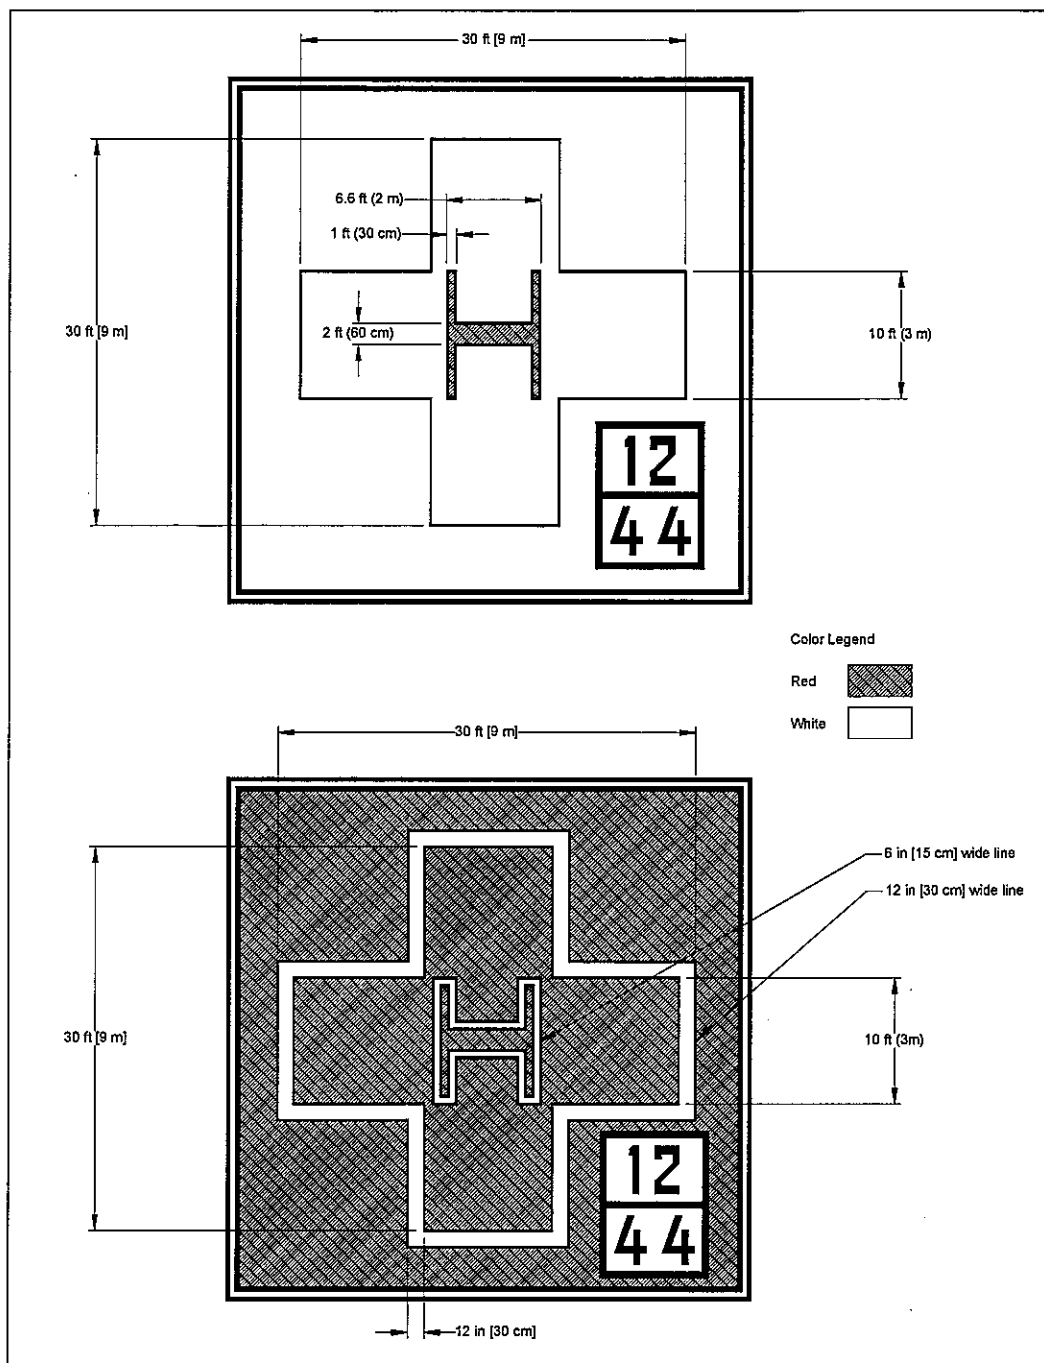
Paved TLOF/Paved FATO – Markings:
